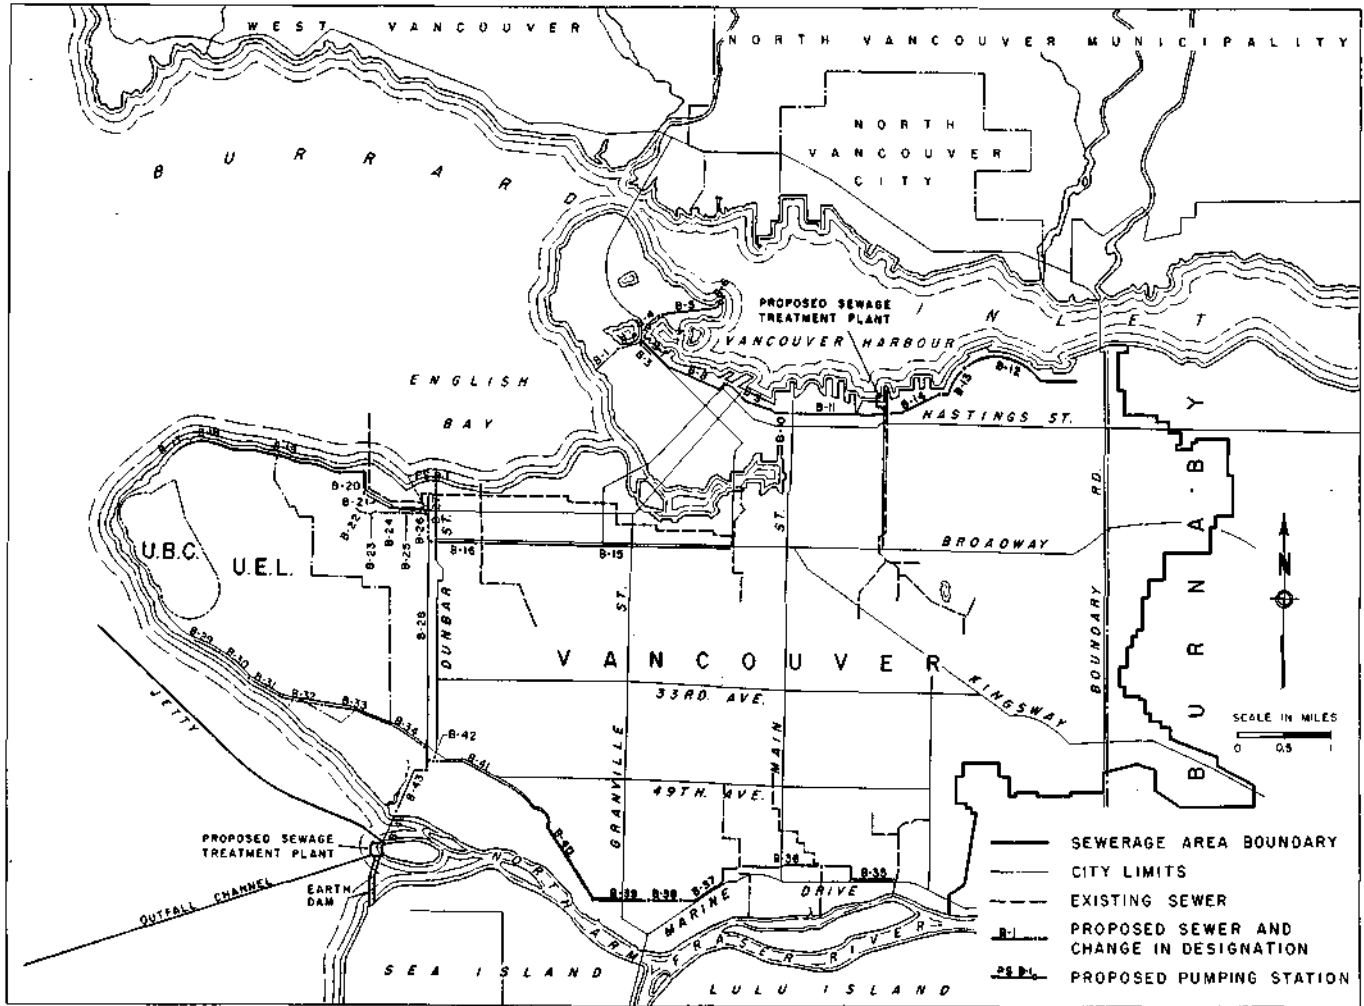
Proposed Layout of Plan B - Vancouver Sewerage Area
